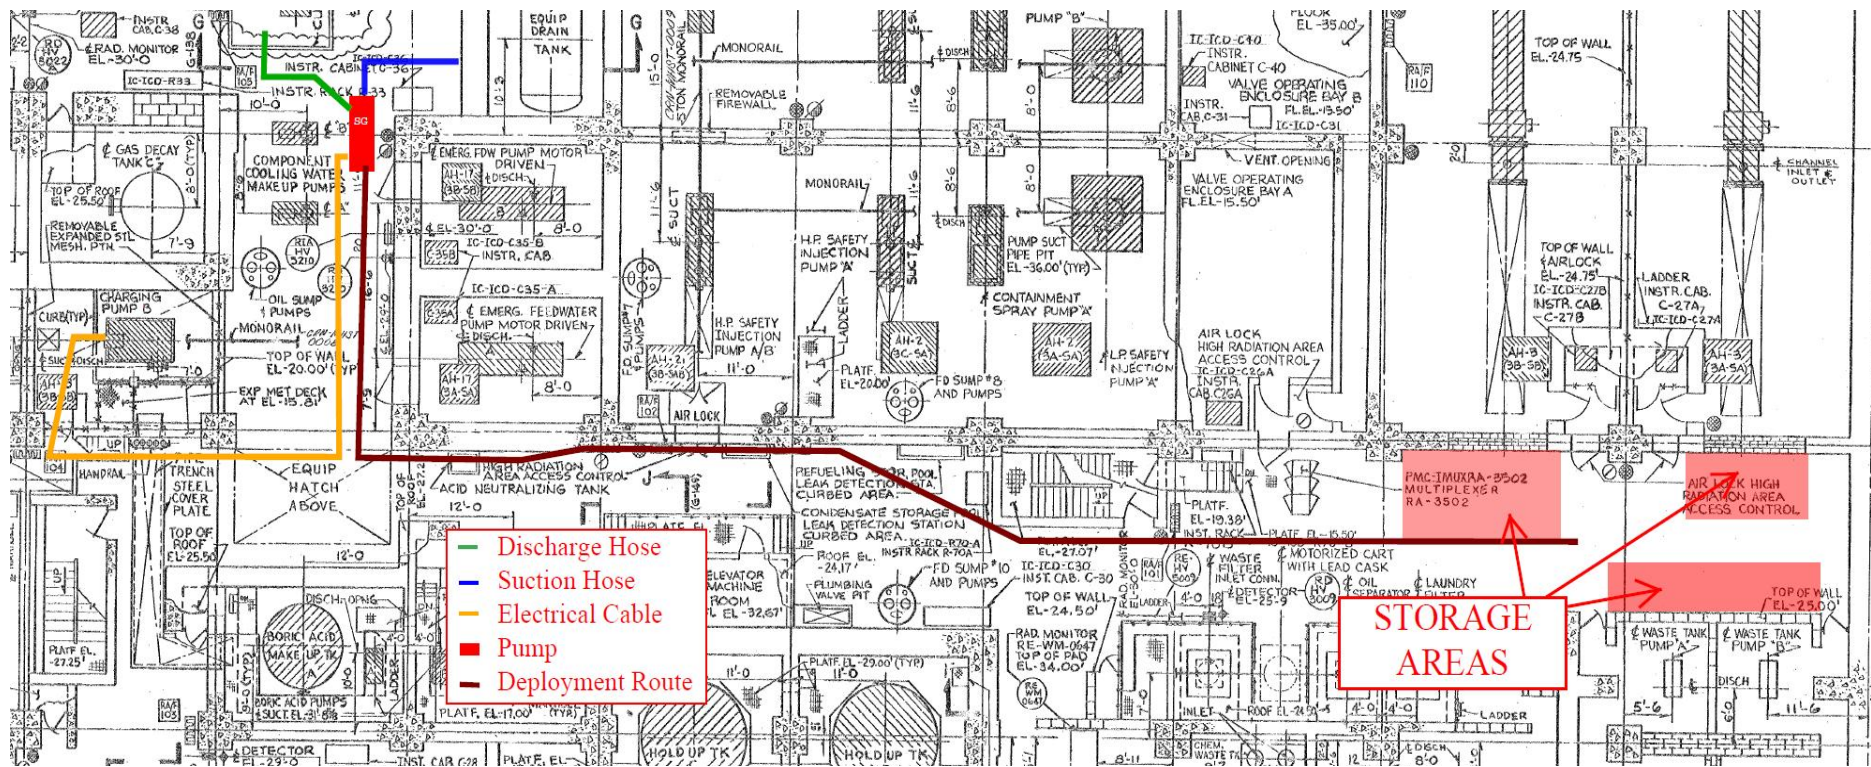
Core Cooling & Heat Removal Primary Conceptual Routing
